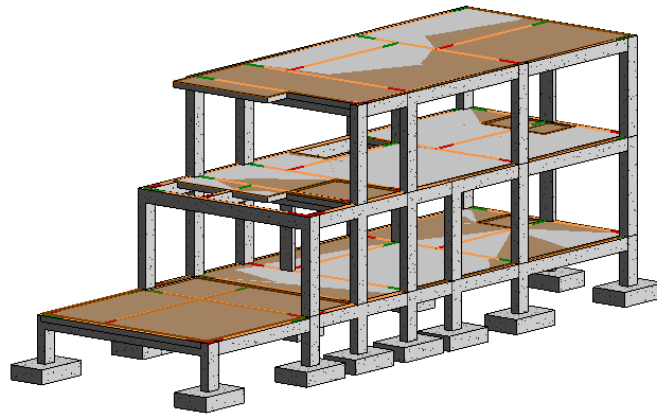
Structural model of a double storey terrace house (Tai, Goh and Seo, 2021)
